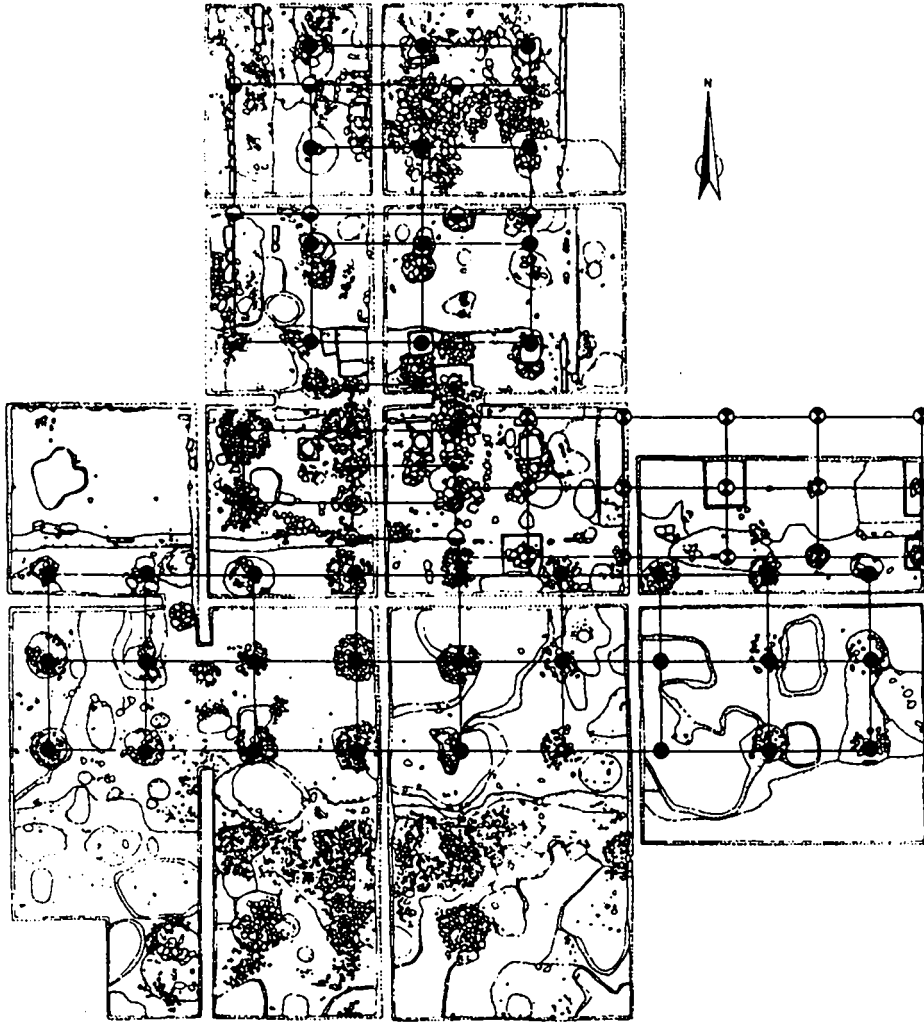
Interpretation of the excavation plan of the south-western corner of Hwang-ryong-sa
